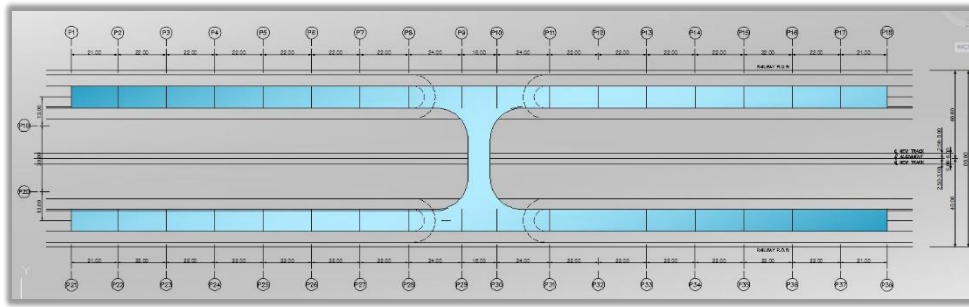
Typical Plan of H Turn Bridge
